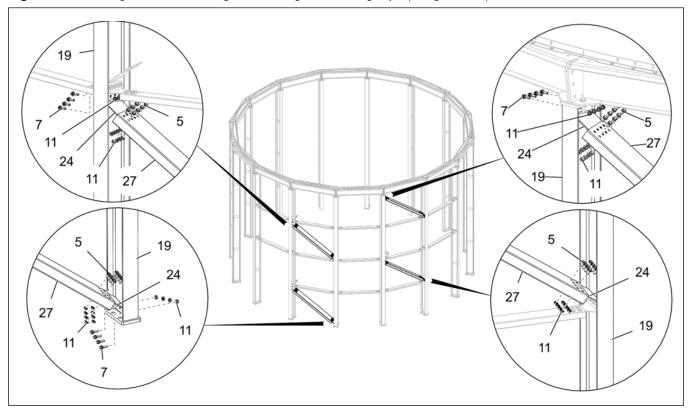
Installing the cross bracings to the diagonal bracing clips (4-leg section)
